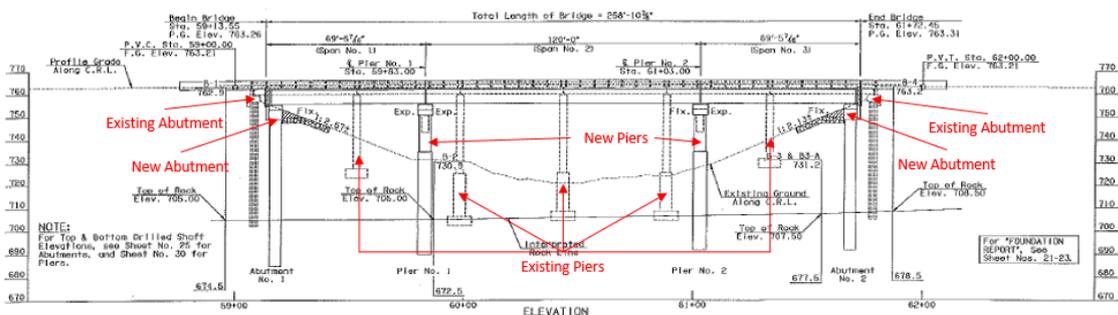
Cotton Creek Bridge over Cottonwood Creek - elevation view
